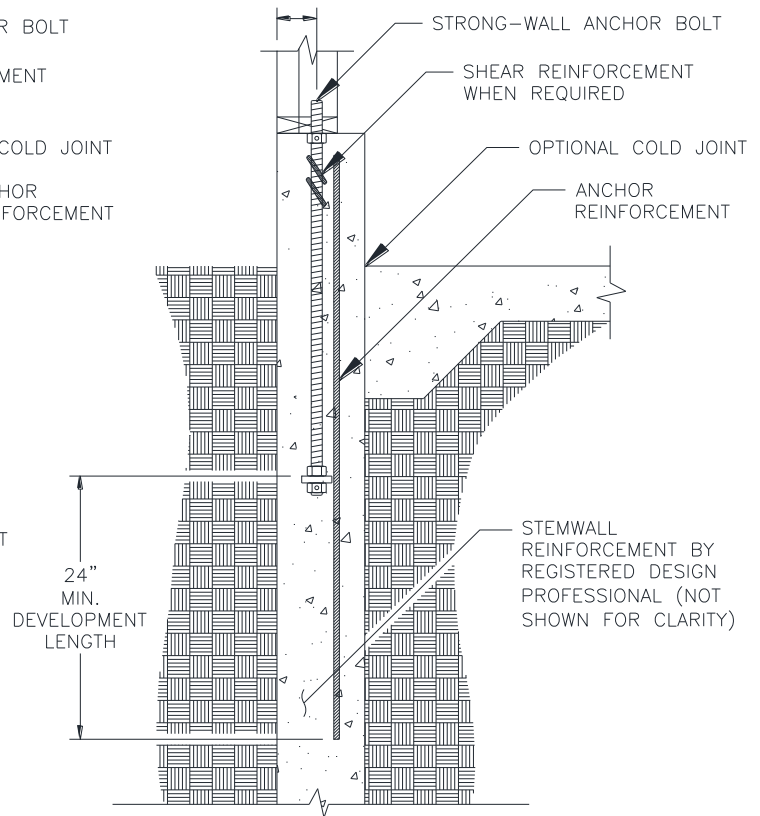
Strong-Wall Flush with Inside Face of 2x6 Wall – Section (Strong-Wall at Edge of Concrete Similar)
